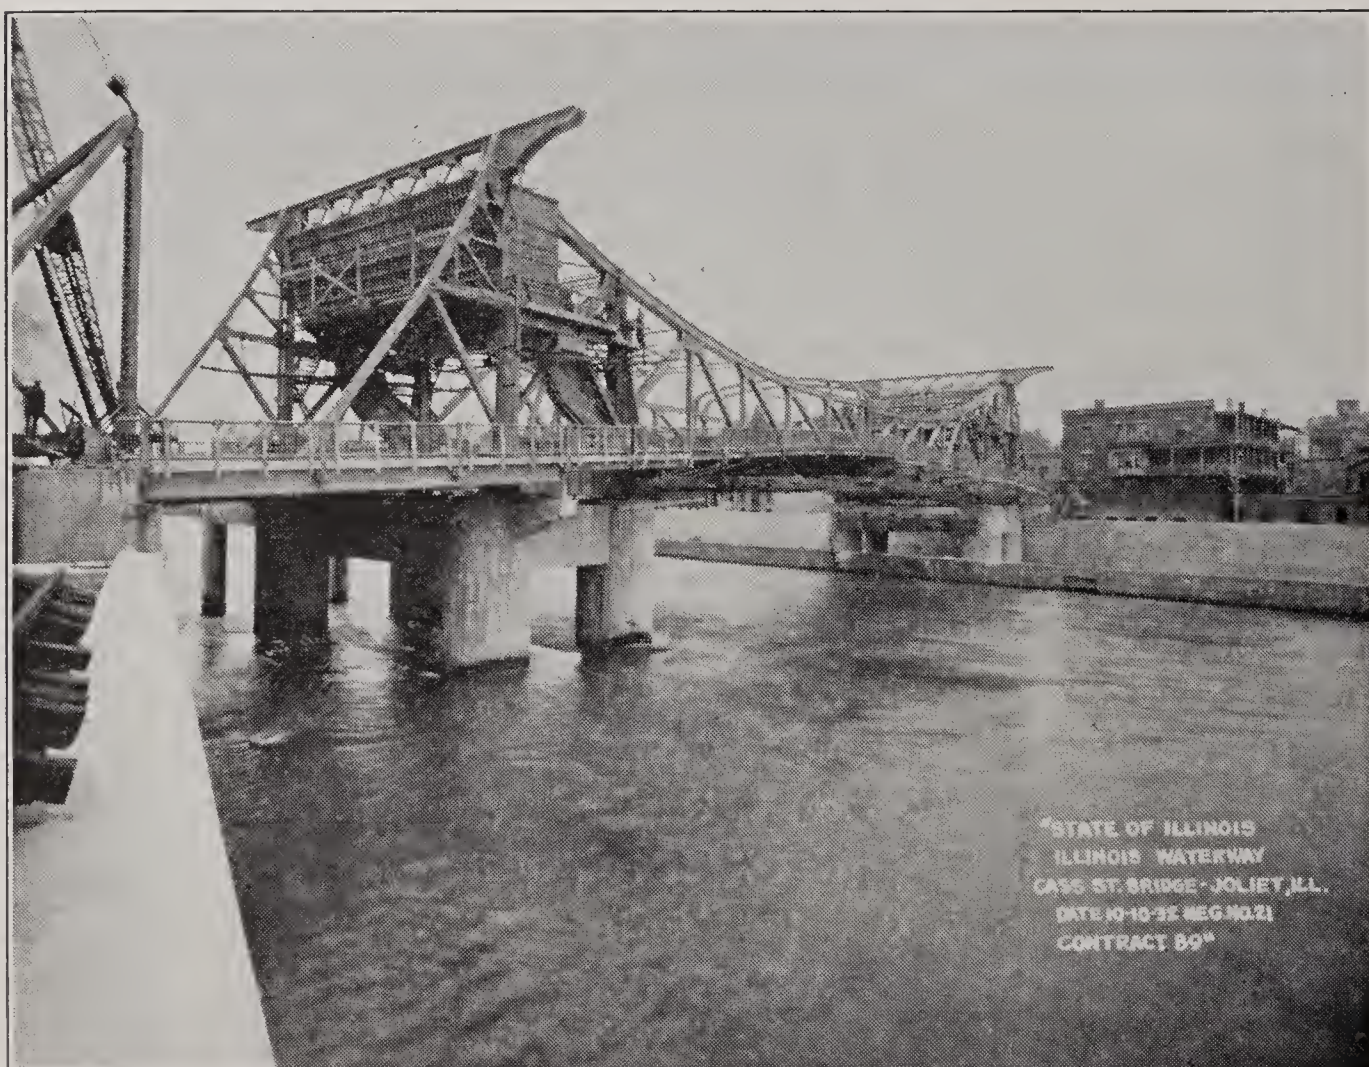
Cass Street Bridge, Joliet, looking southwest.
